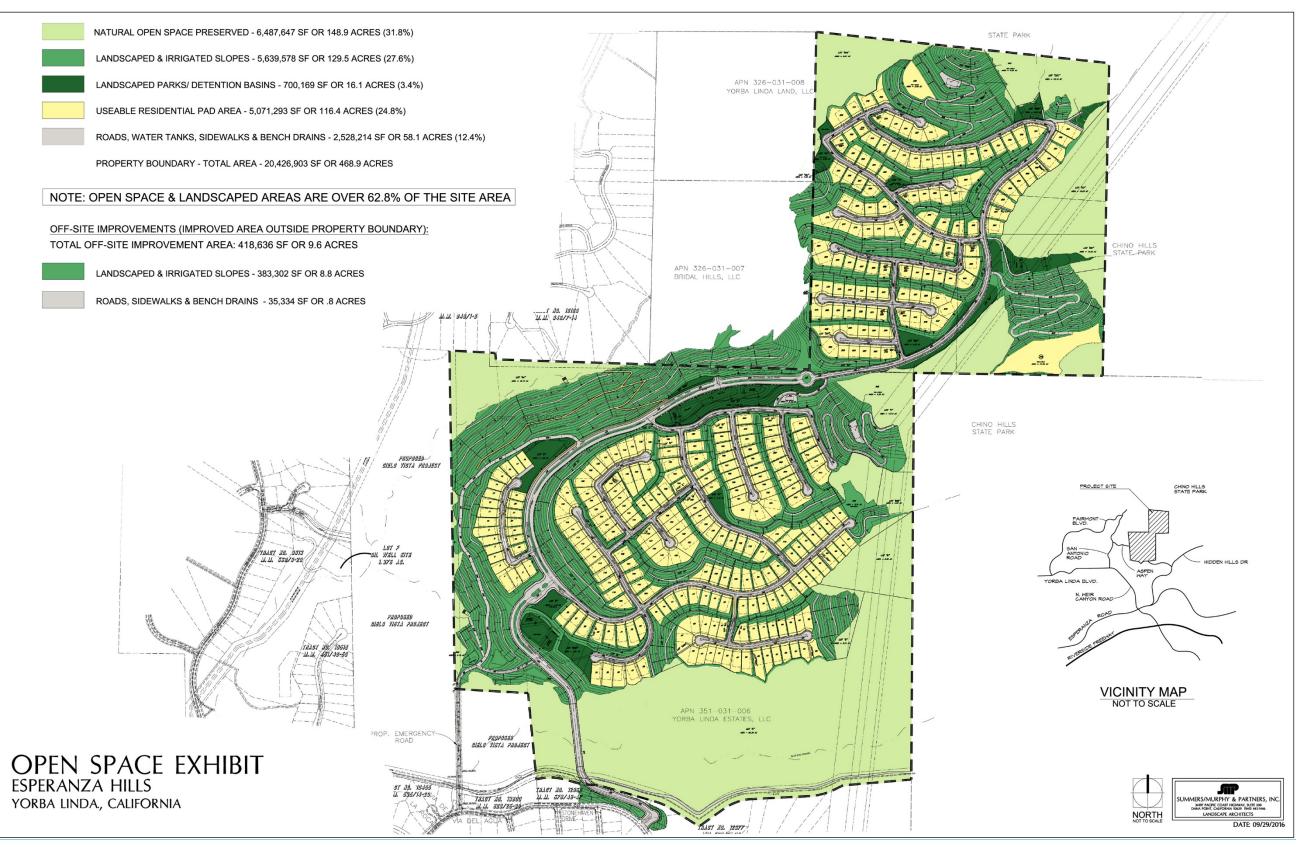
Exhibit 12 - Open Space, San Antonio Road Access Configuration
